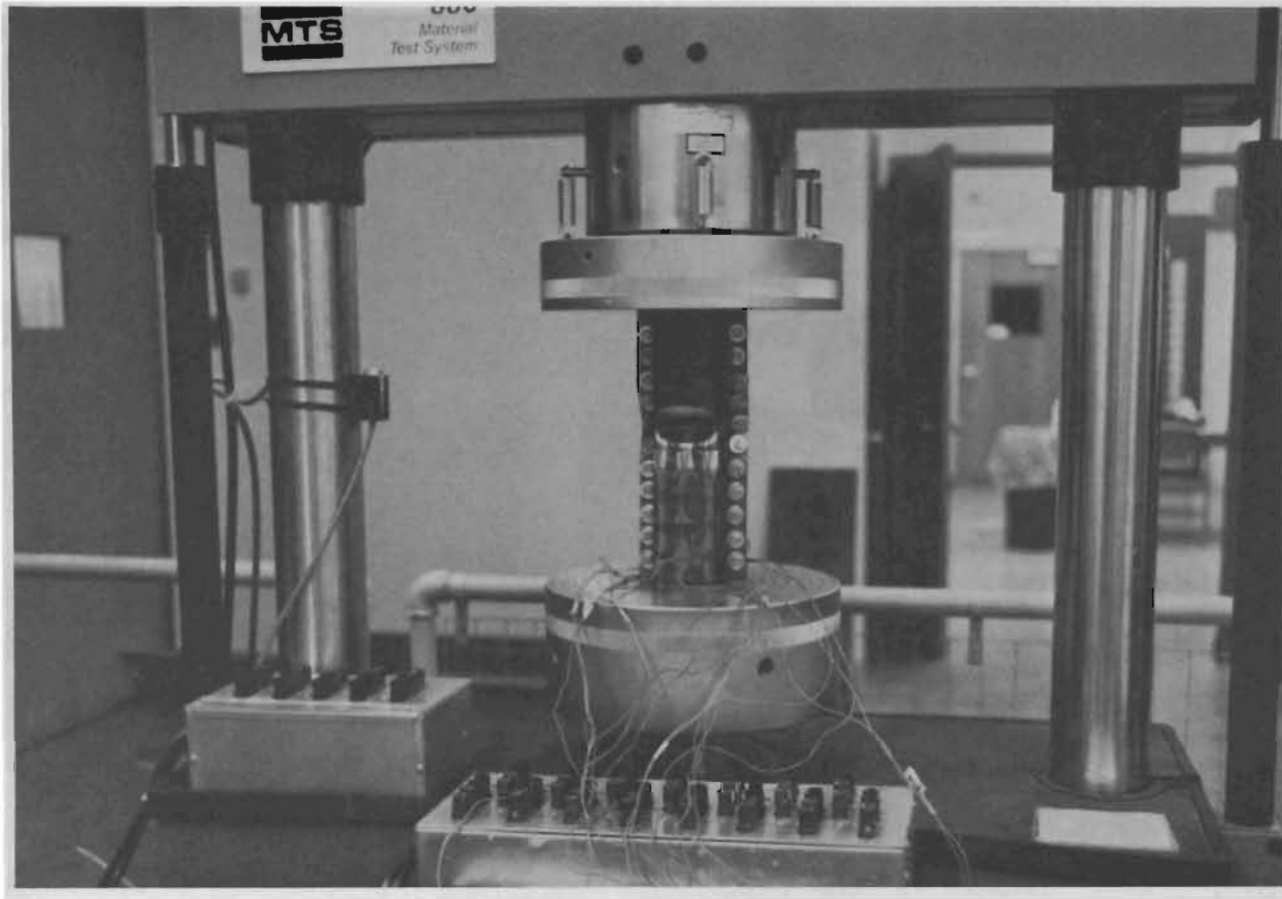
Failure of Stub Columns with Stiffened Flanges (Front View)
